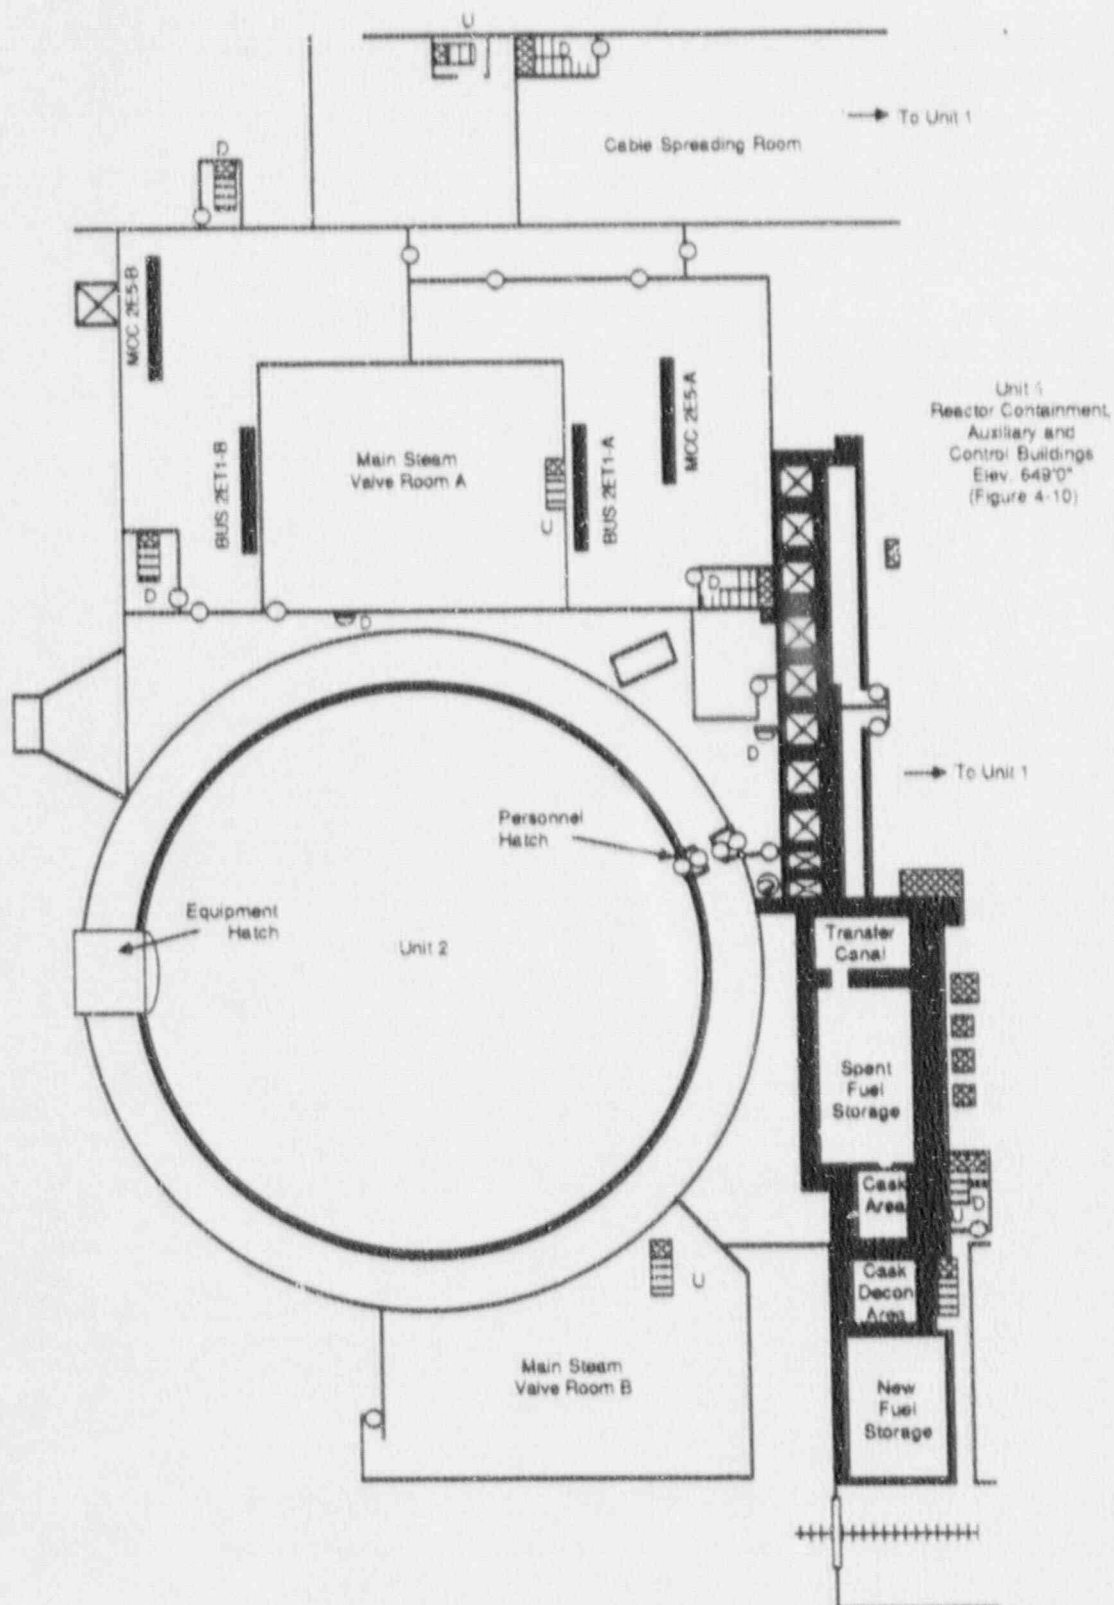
Bellefonte 2 Reactor Containment, Auxiliary and Control Buildings, Elevation 649'0"
